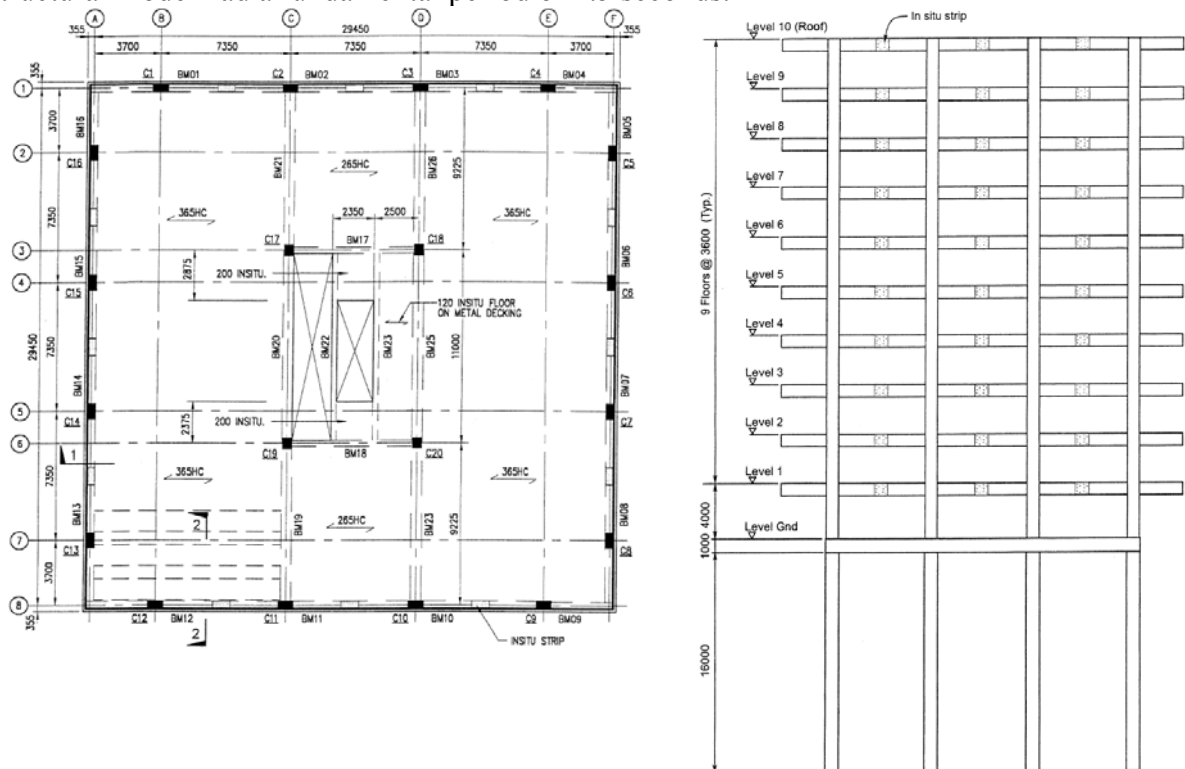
(a) Plan, and (b) elevation of the Red Book building.
